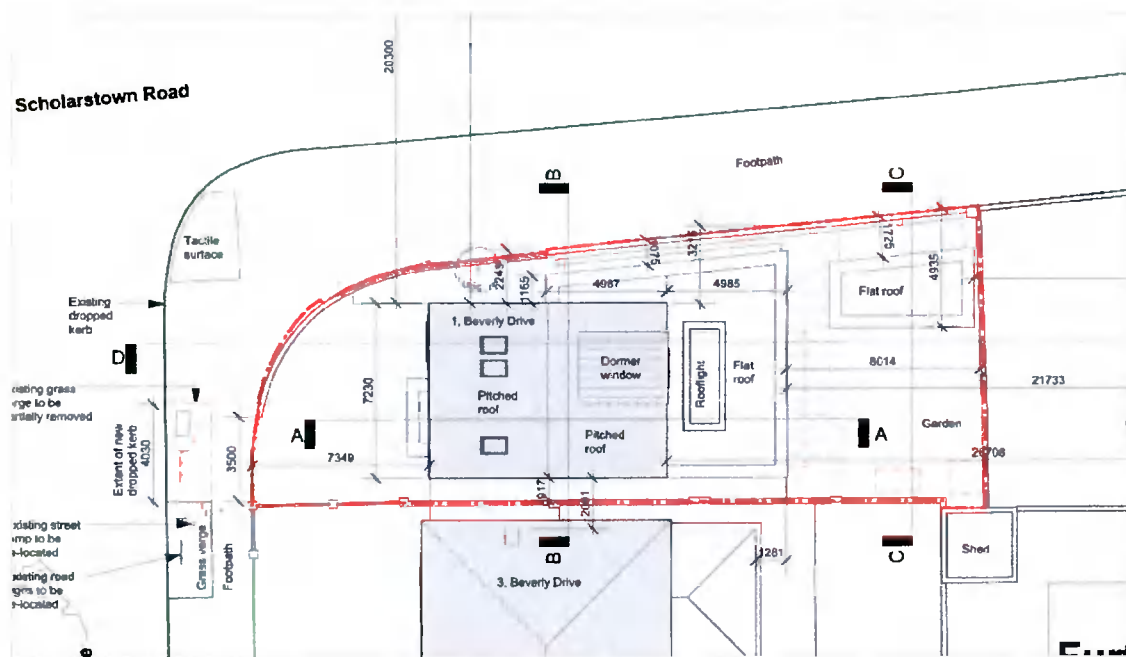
Proposed site plan for no 1 Beverley Drive.
